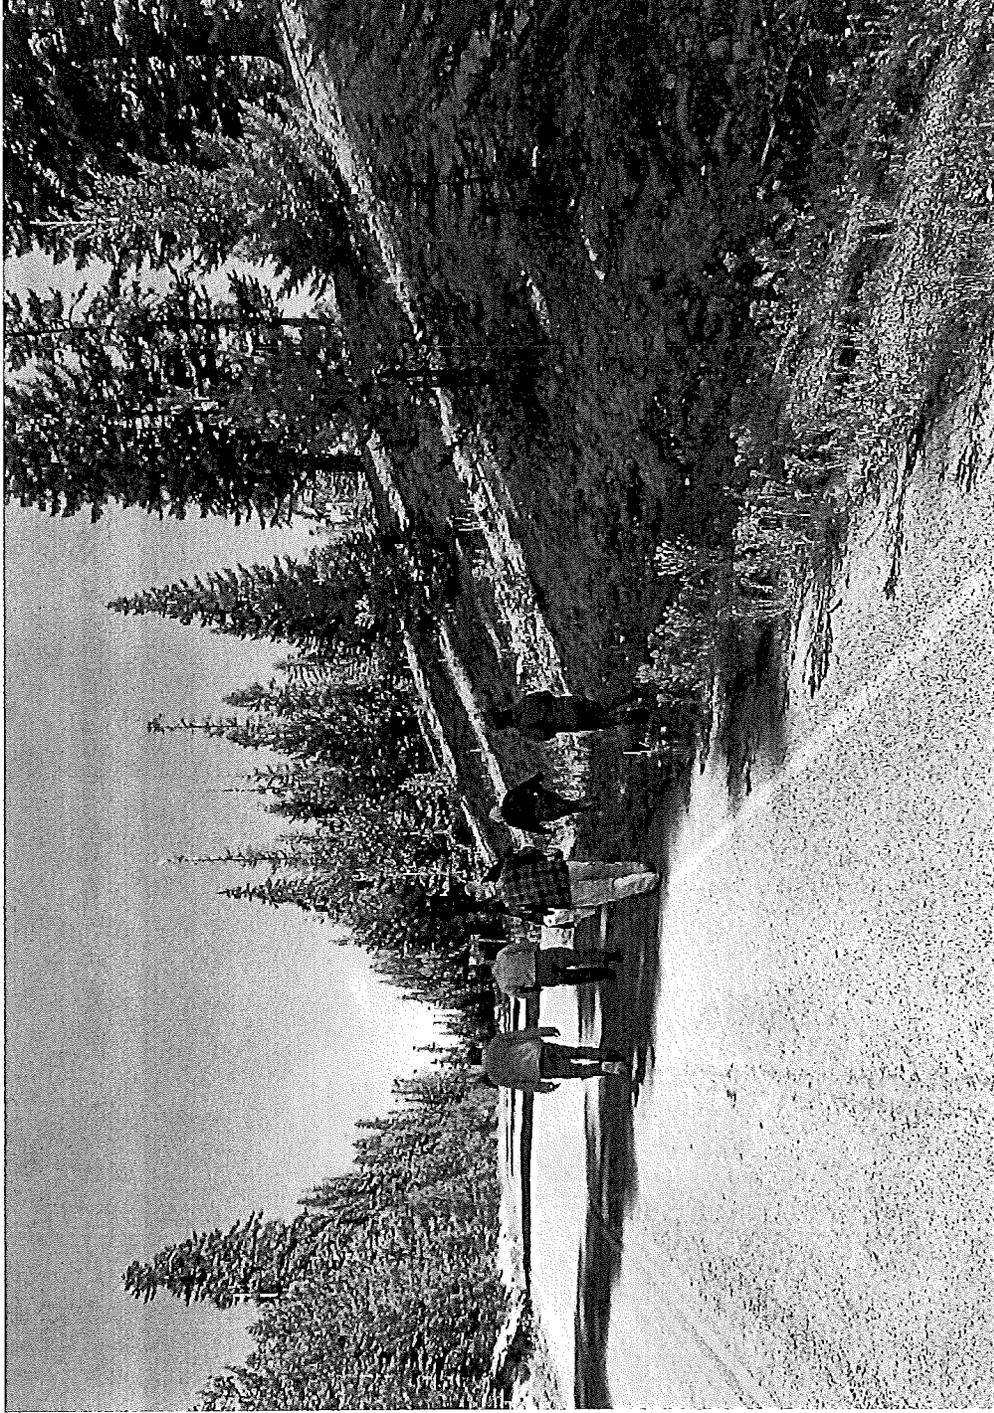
South portal proposed location in northbound lane and shoulder of NFD 44 Road. Portal will be located approximately where people are walking.
